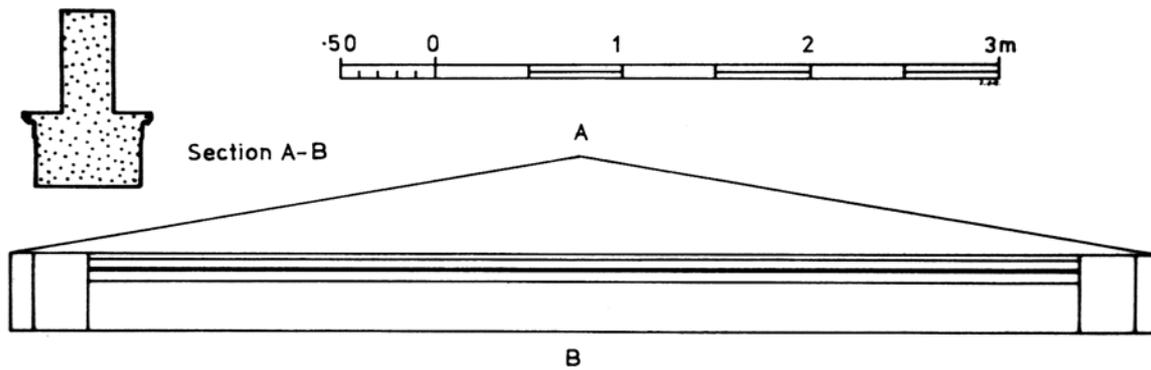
Roof beam of variable section, Hieron at Samothrace (late 4th Century). Section and elevation. (Coulton)
